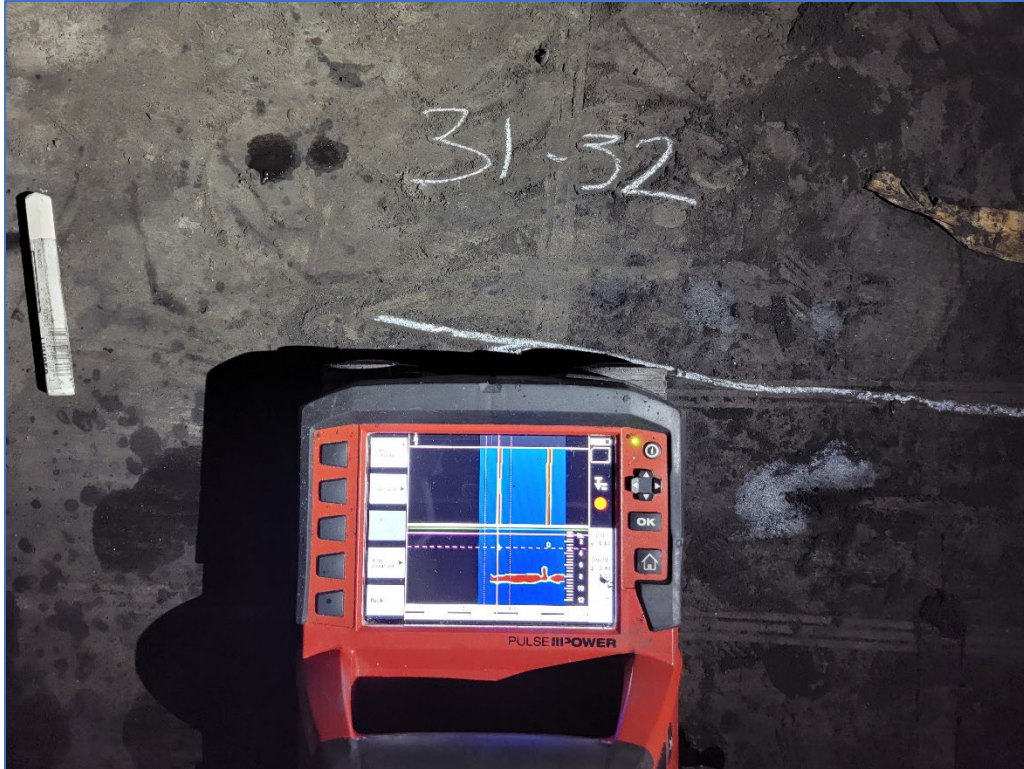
Concrete GPR scanner to locate embedded reinforcement to avoid impact with core drill.
